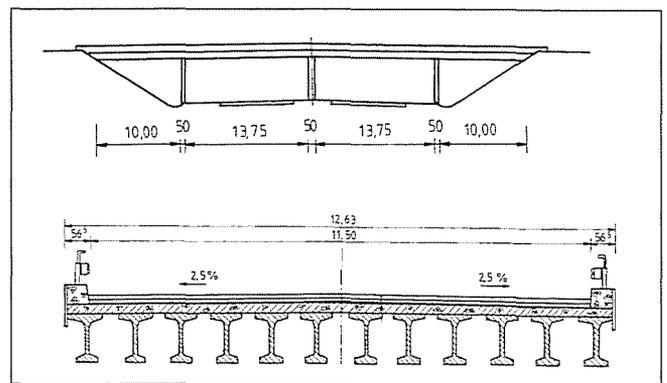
Sketch of a usual prestressed concrete highway bridge
